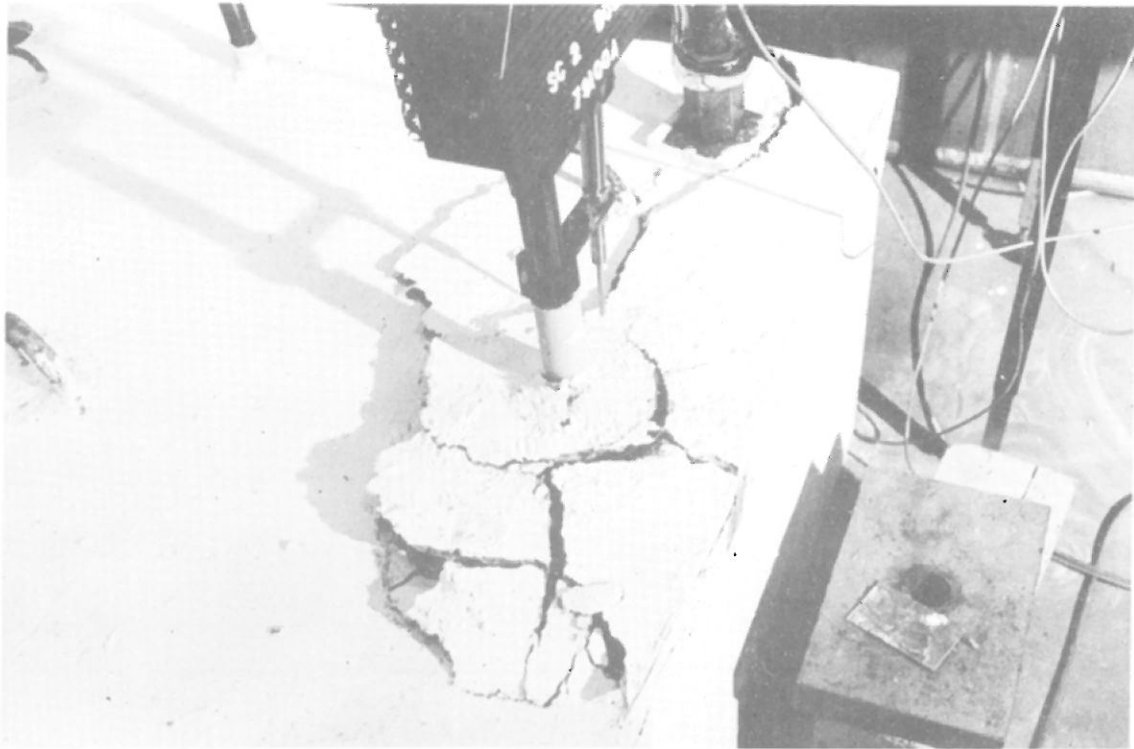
Anchor bolt SC 2:4 at failure (continued)
